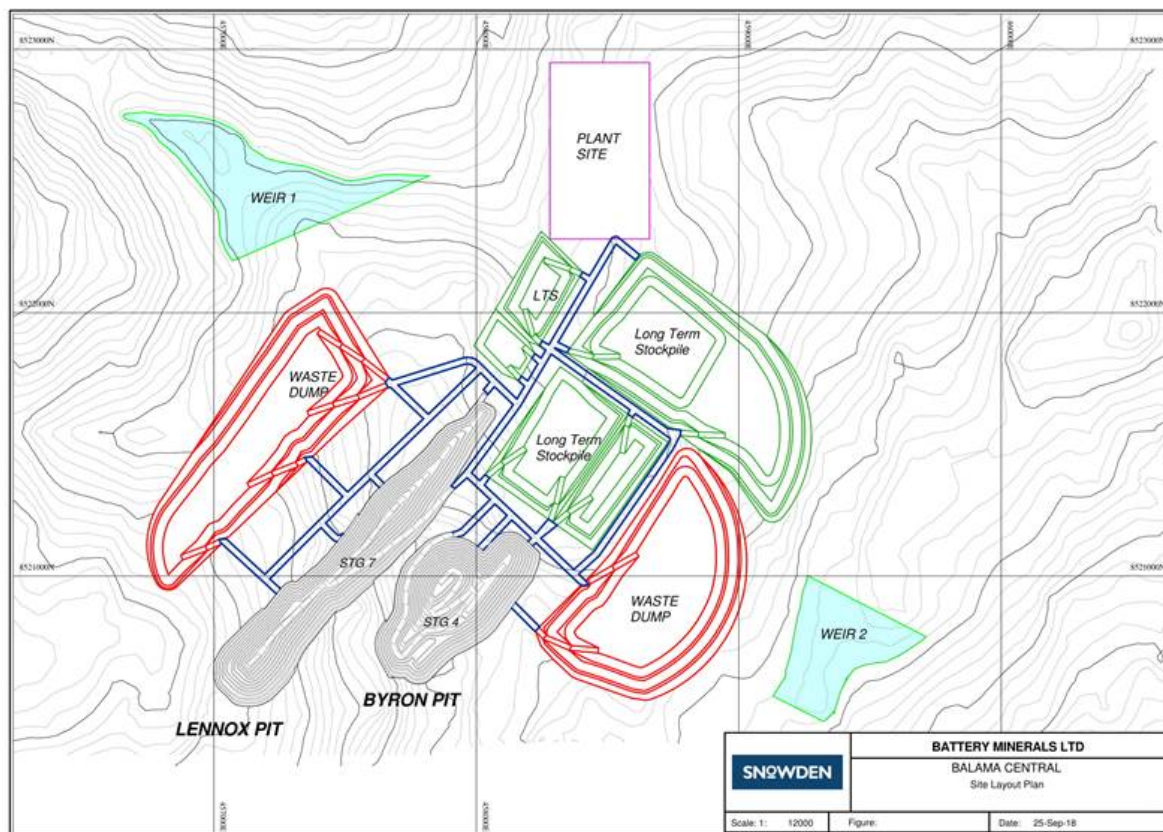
Balama Central Graphite Project: Mine & Processing Site Layout.
